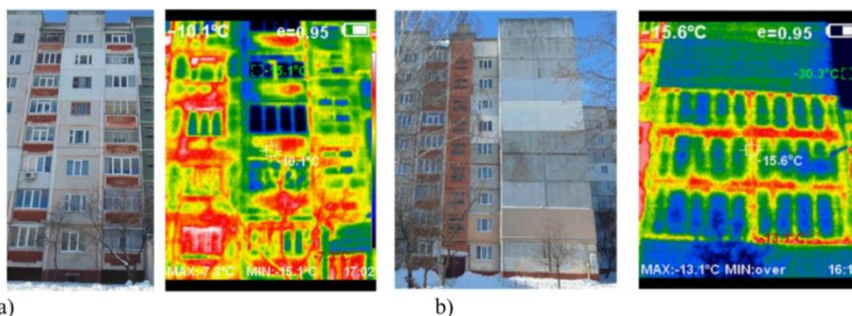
Panel house: a) photo of panel house; b) partial insulation of buildings
